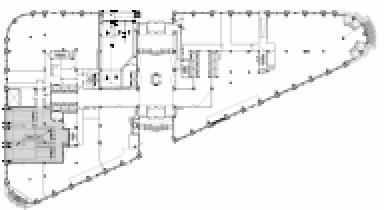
1st Typical floor plan of 901 New York Avenue
